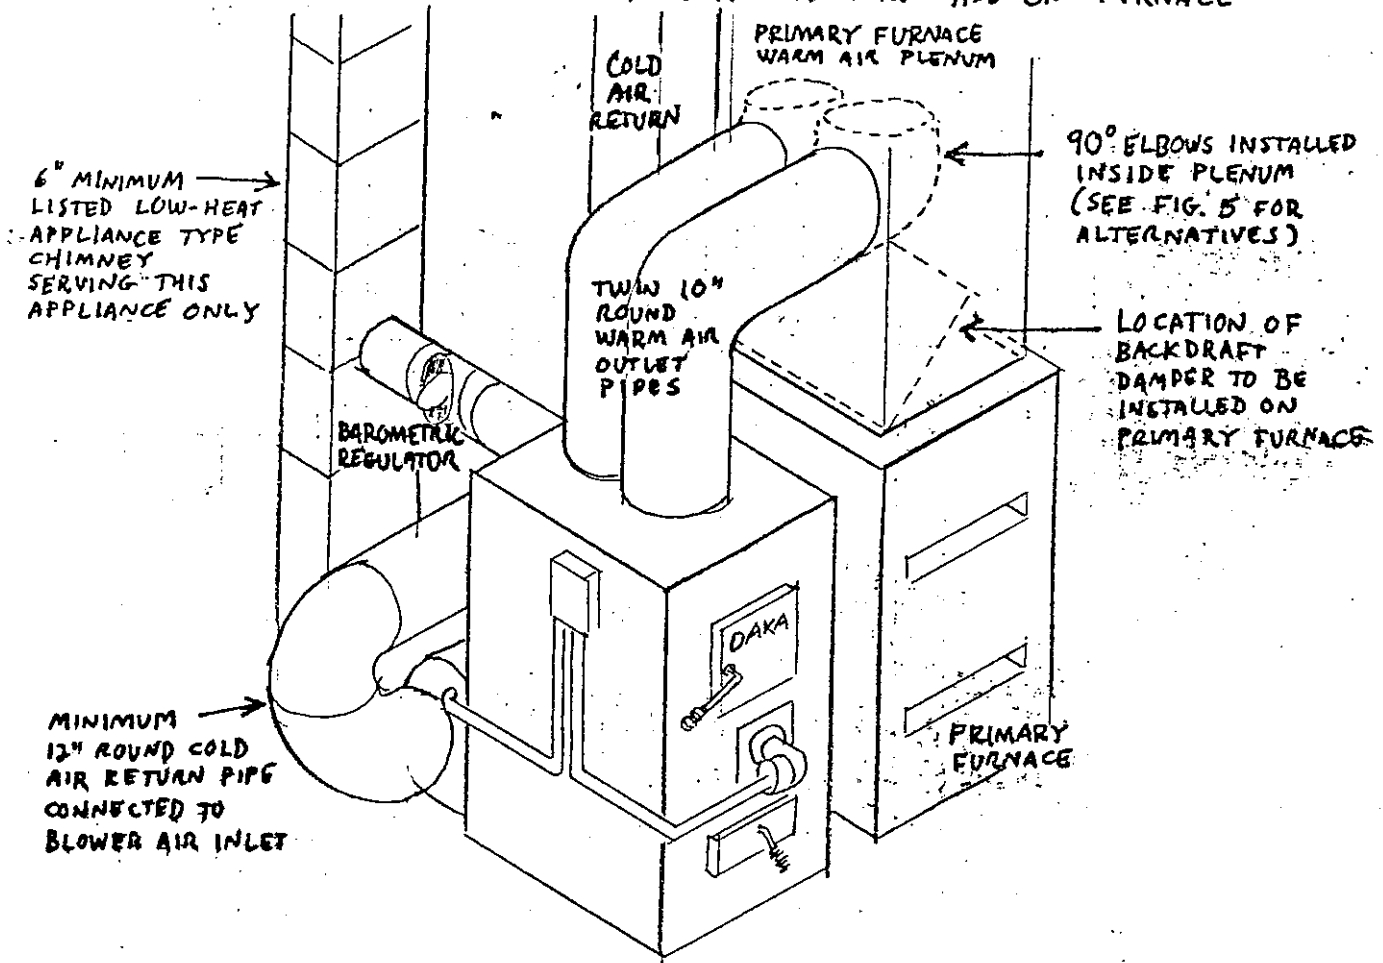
TYPICAL INDEPENDENT CENTRAL FURNACE INSTALLATION
